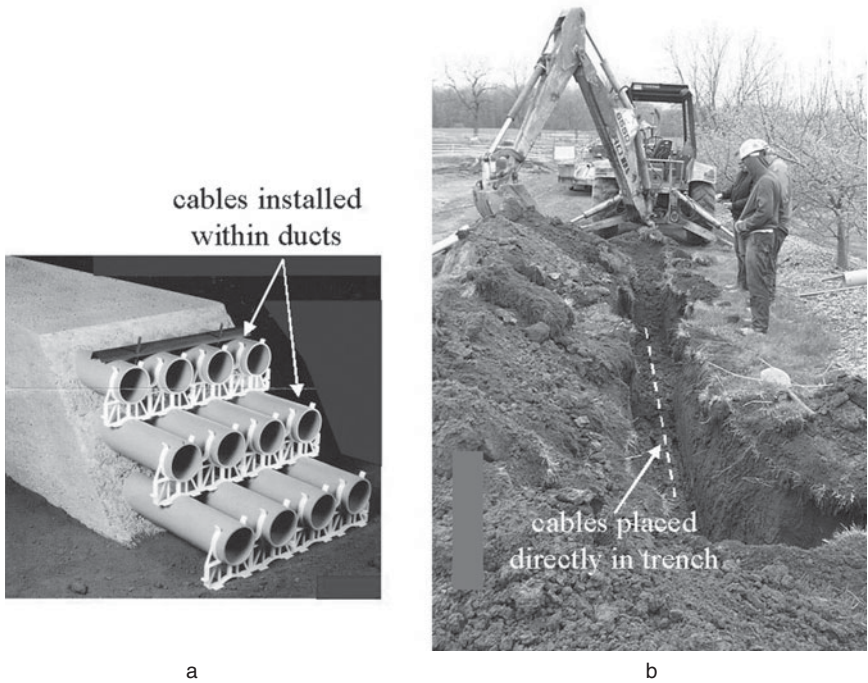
Typical Belowground Construction. (a) Undergrround Conduit (Courtesy of Underground Devices) and (b) Direct-Buried.
